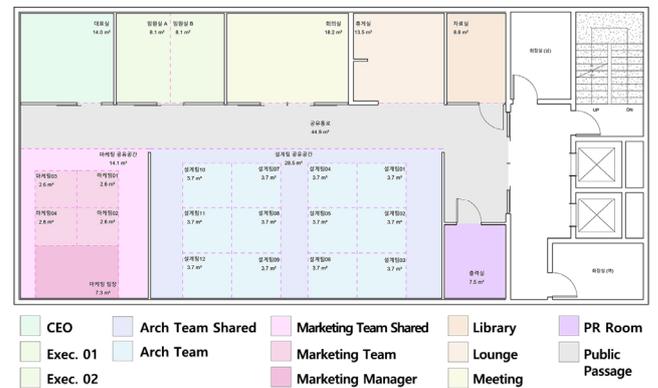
Area Plan for mid-sized architectural office with 20 employees
